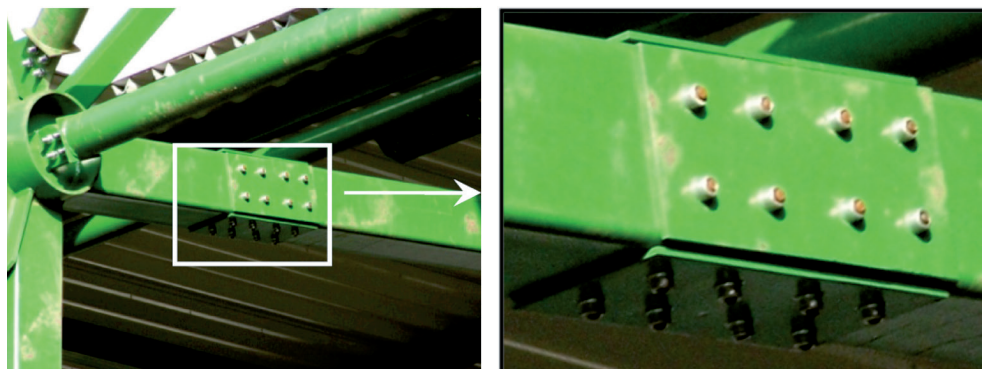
Splice with blind fasteners BOM in the bottom chord of the truss made of tubular sections
